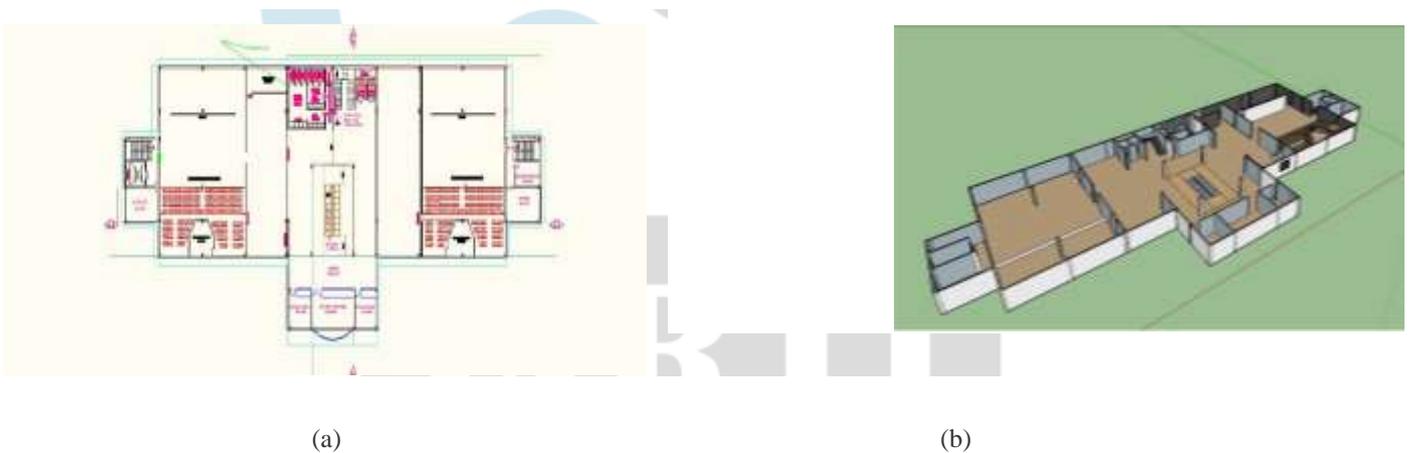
(a) Plan of top floor (b) Sketchup designed view of top floor
